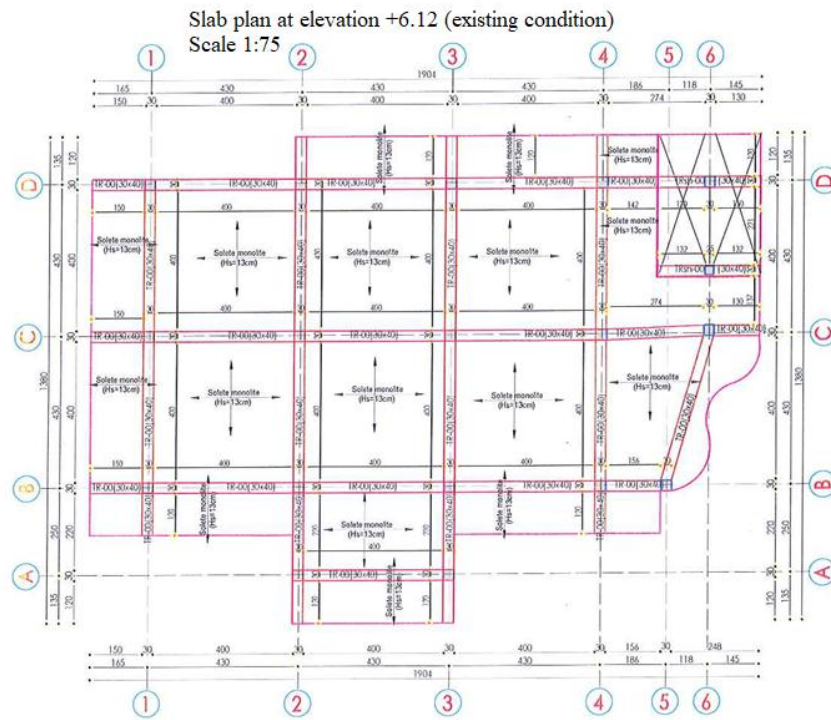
Plan of the existing structures at elevation 6.12 [2]
